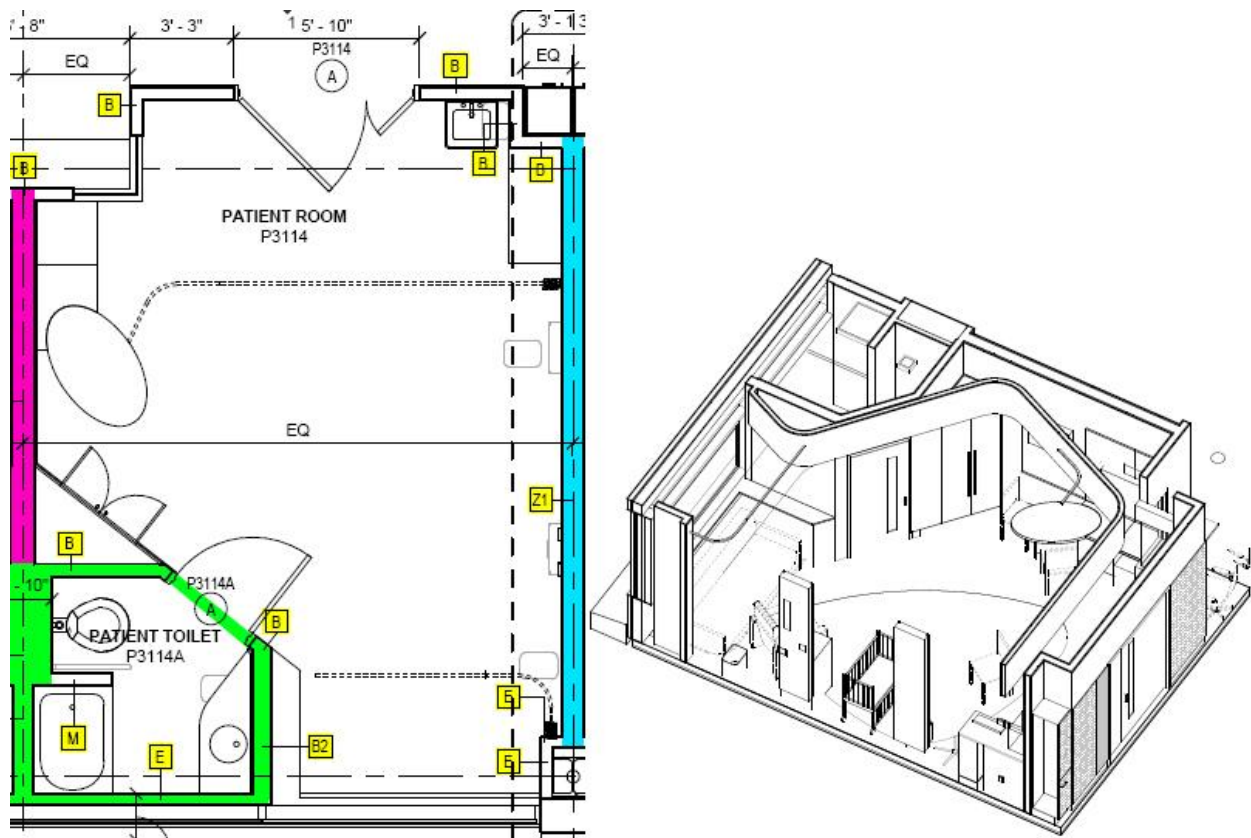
Plan and 3D View of a Typical Patient Room
